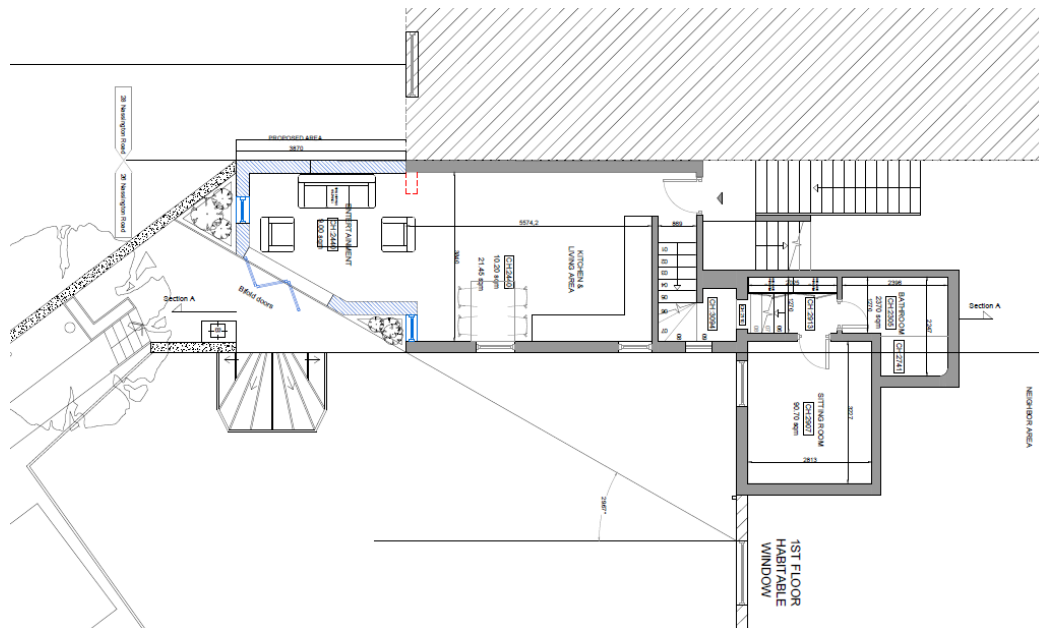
Proposed ground floor layout demonstrating the extension to the ground floor of the property. The plan also shows that the extension will meet the 45 degree angle visual intrusion rule.
